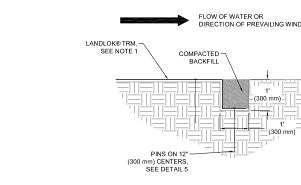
INITIAL CHANNEL (IC) TRENCH (DOWNSTREAM)
